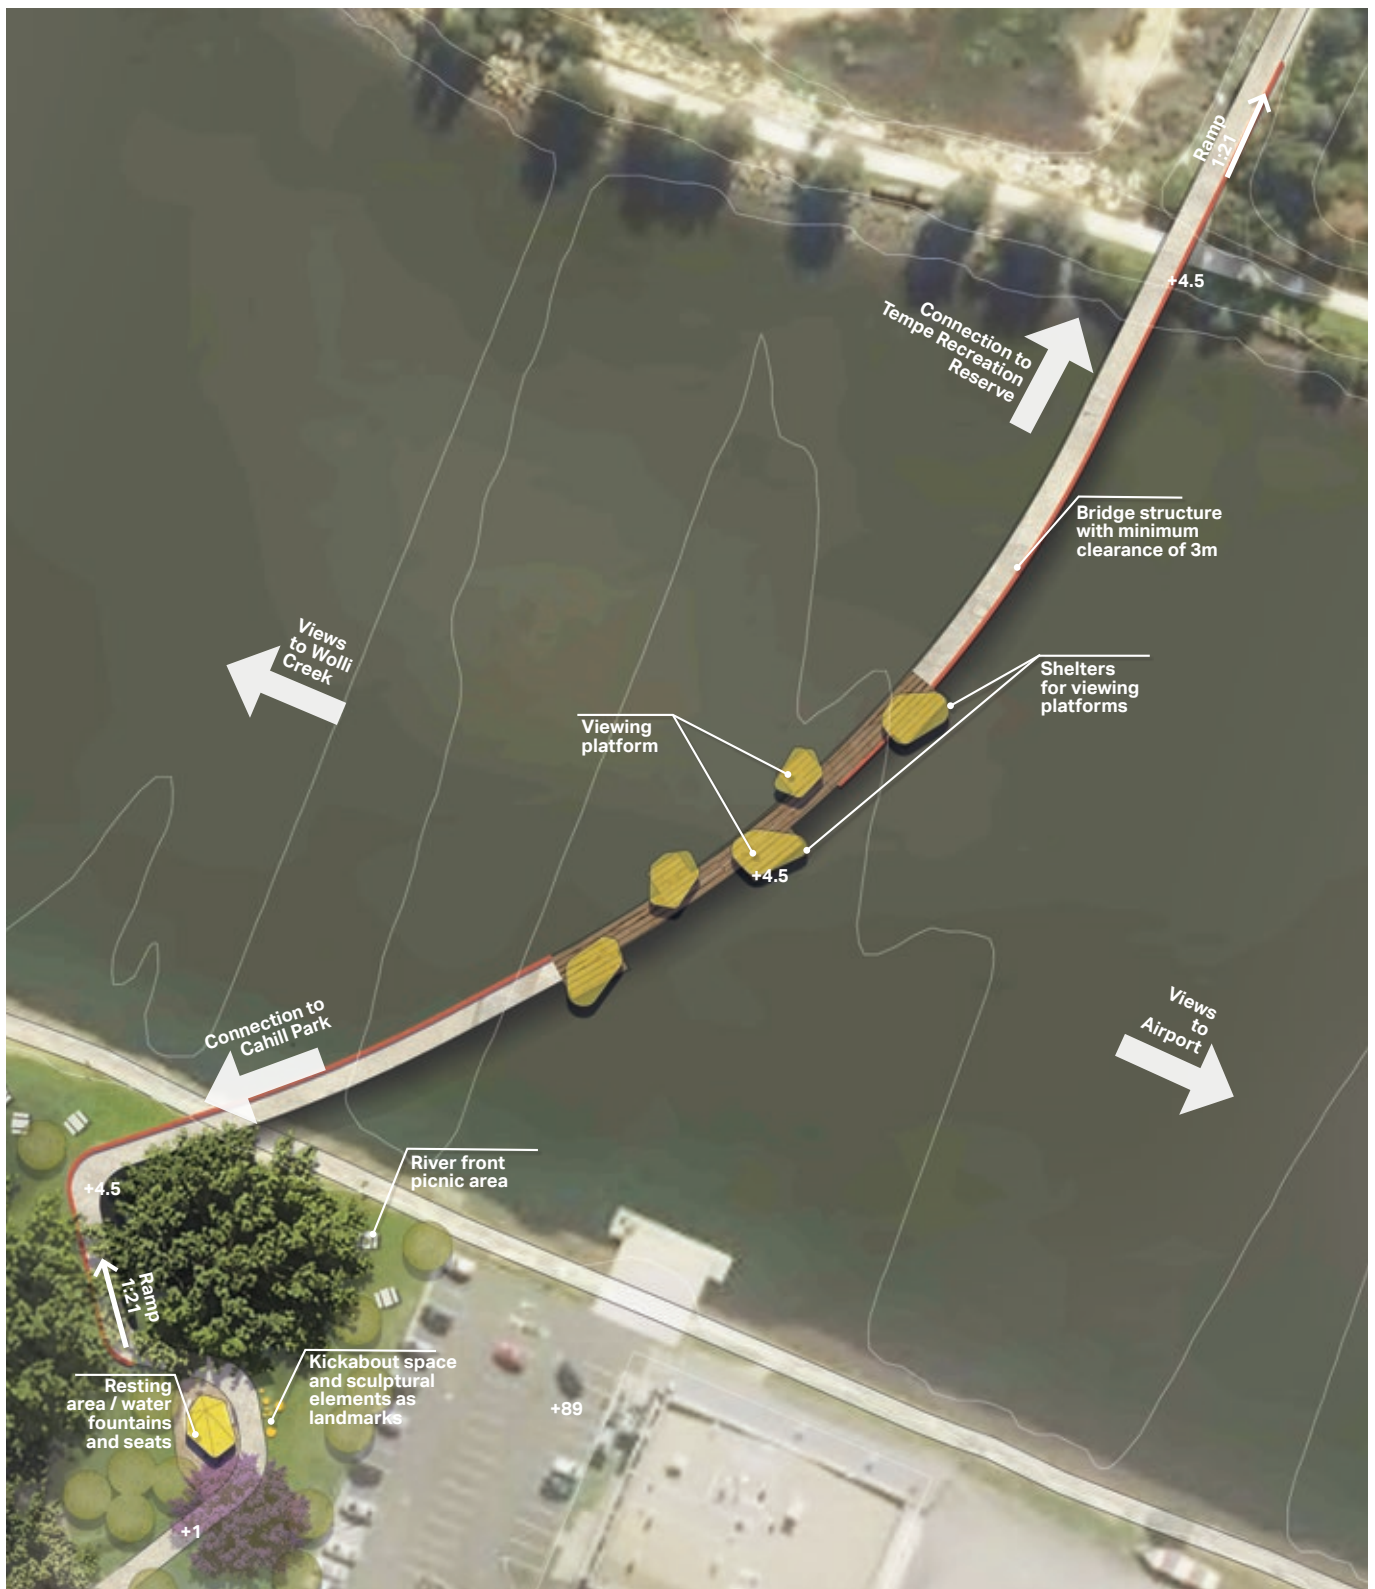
Tempe Reserve Bridge Concept Plan (Source: AECOM, 2018)
